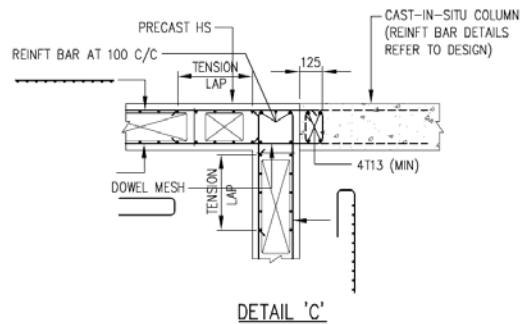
CONNECTION DETAILS BETWEEN PRECAST HS AND CAST-IN-SITU WALL/COLUMN
